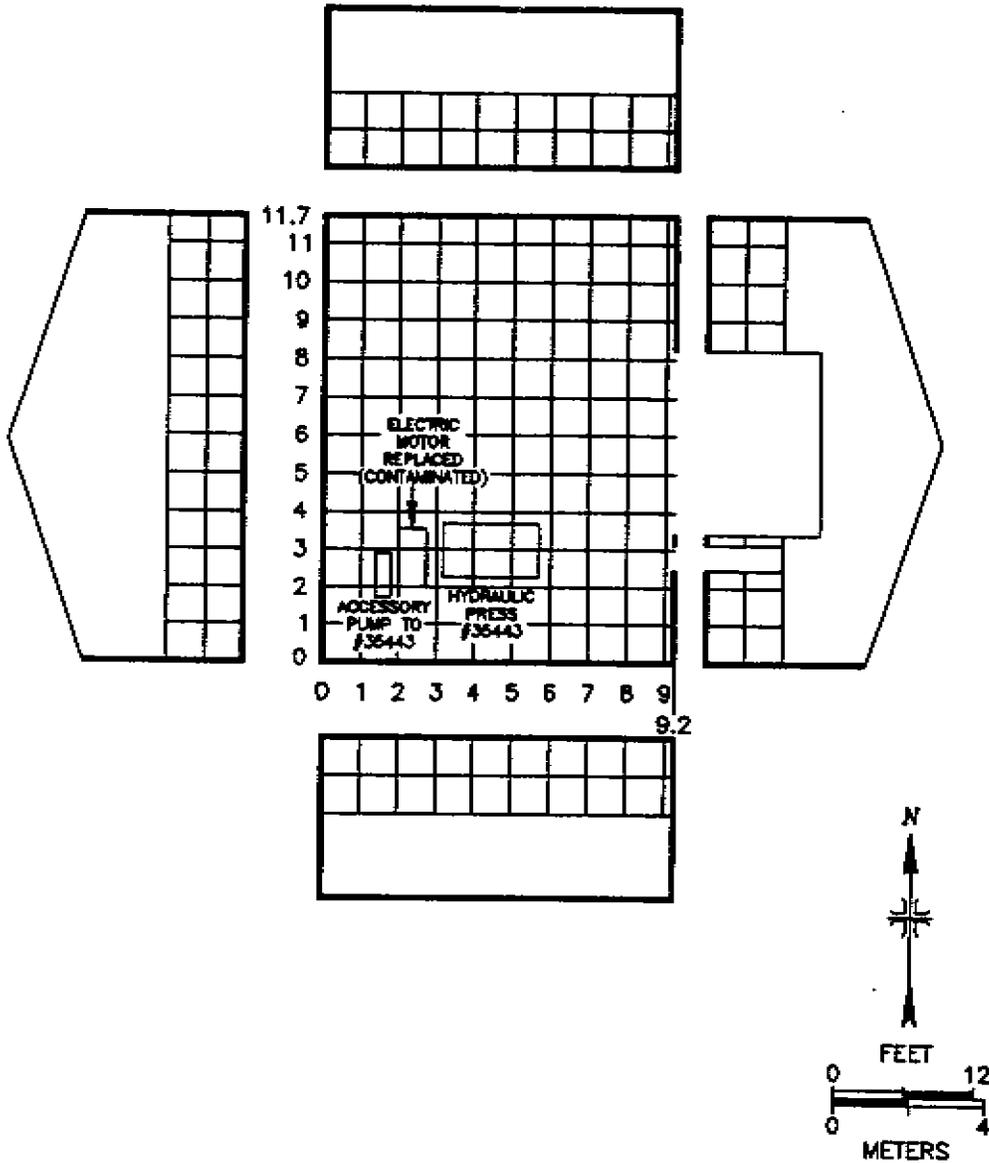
Building 3, Room 102, Indicating Location of Hydraulic Press #35443
